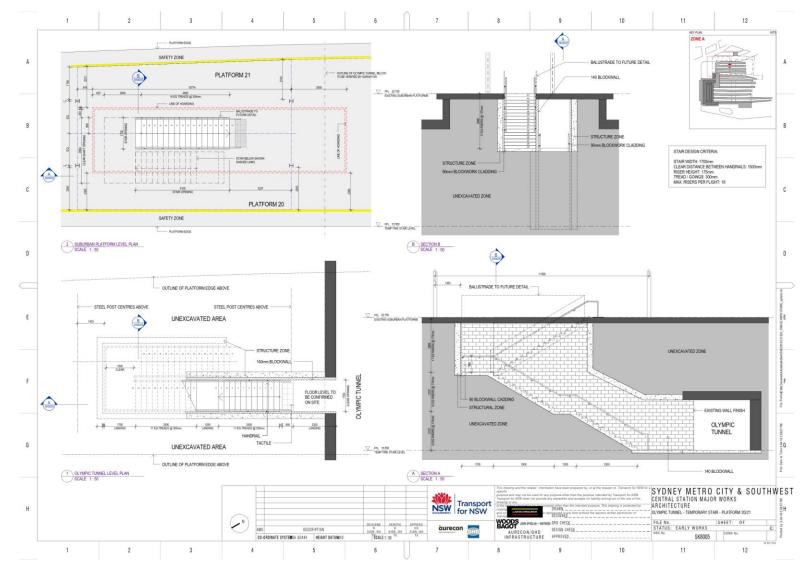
Proposed hoarding and initial 2m deep excavation for the future temporary staircase on Platform 20/21 (Source: Laing O'Rourke, 2018).
